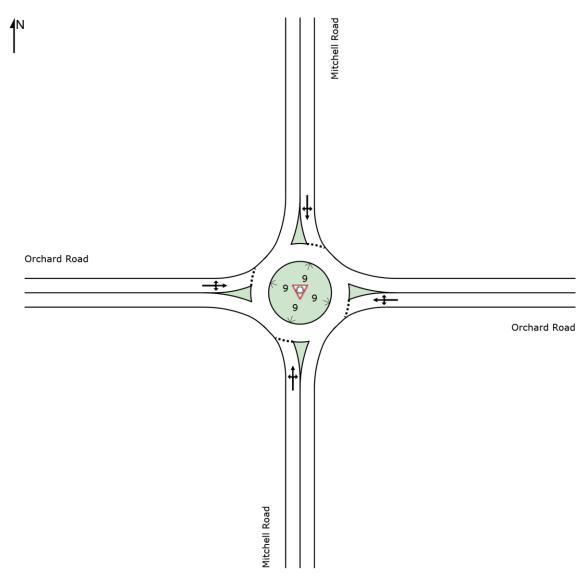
Roundabout Intersection Layout of Mitchell Road with Orchard Road (SIDRA)
